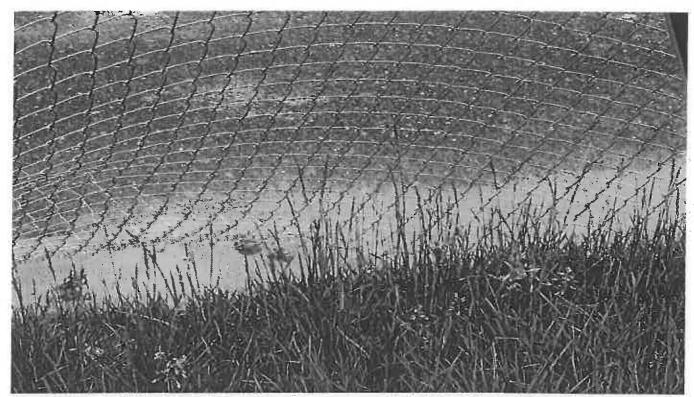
Sediment laden stormwater runoff from site to the stormdrain at Gossett Football Team House lot.
